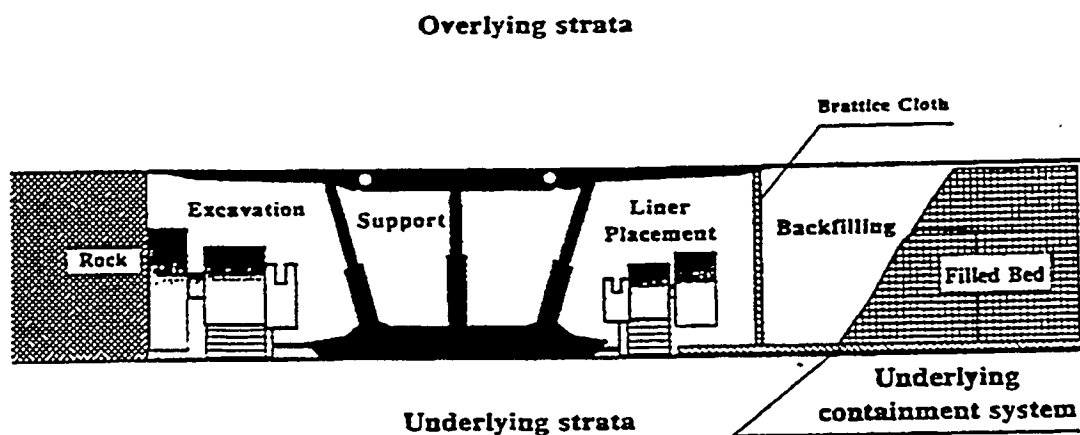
Profile of the roof support shield, mining shearer, placement of the hydraulic barrier, liquids collection system and backfilling operation.
